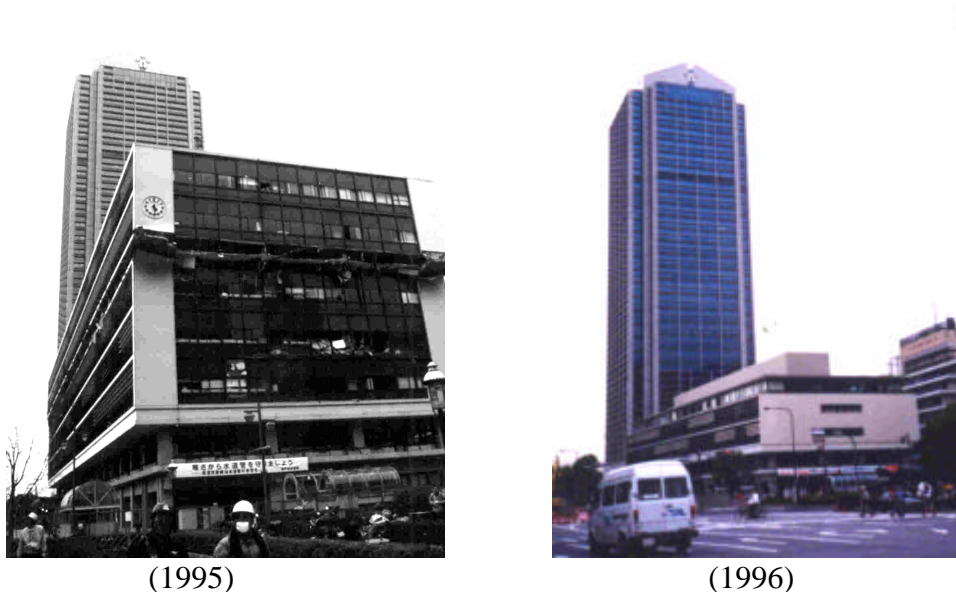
The 35-story shear wall building in Kobe (in the background) sustained minor damage in 1995 while the City Office building in foreground lost its 3 top floors. (Photos by A. Astaneh-Asl and M. Kanada, from (Kanada and Astaneh-Asl, 1996)
